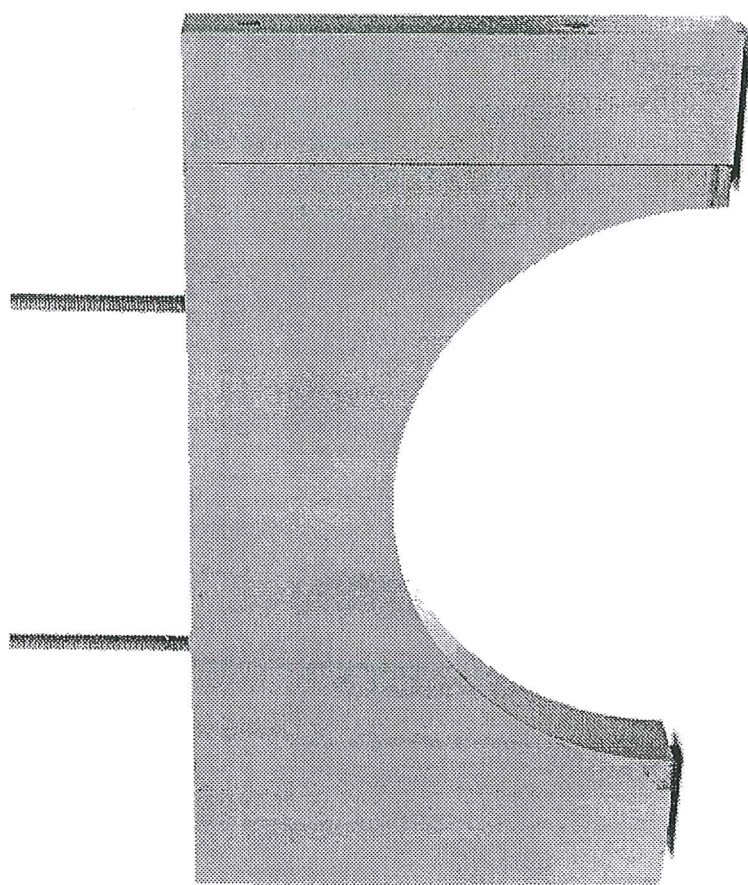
SINGLE SEMI-CIRCULAR ARCHED BRIDGE
